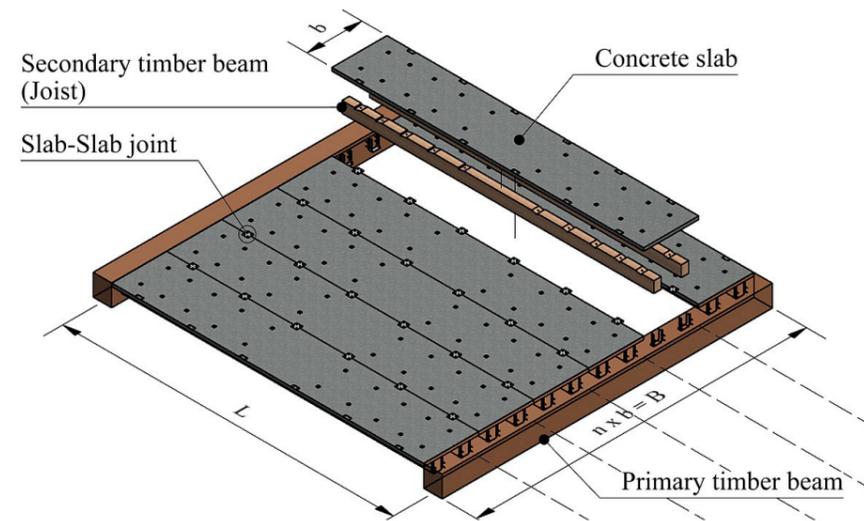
Prototype 3 — Block typology: demountable floor – timber-concrete
